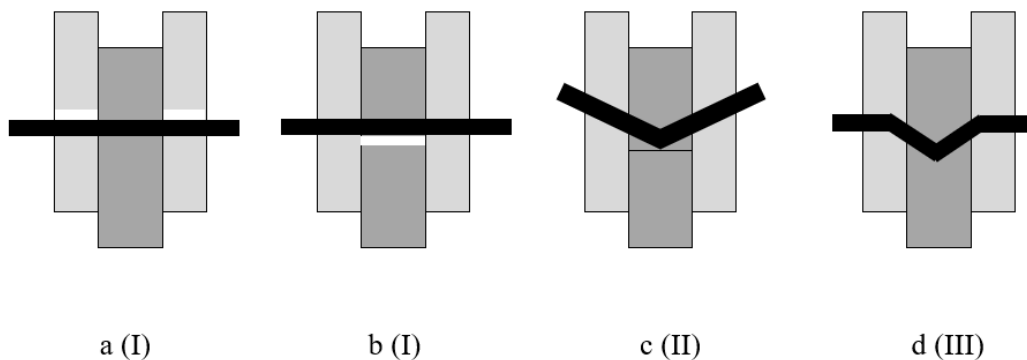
Different failure modes for timber-to-timber fastener in double shear.
